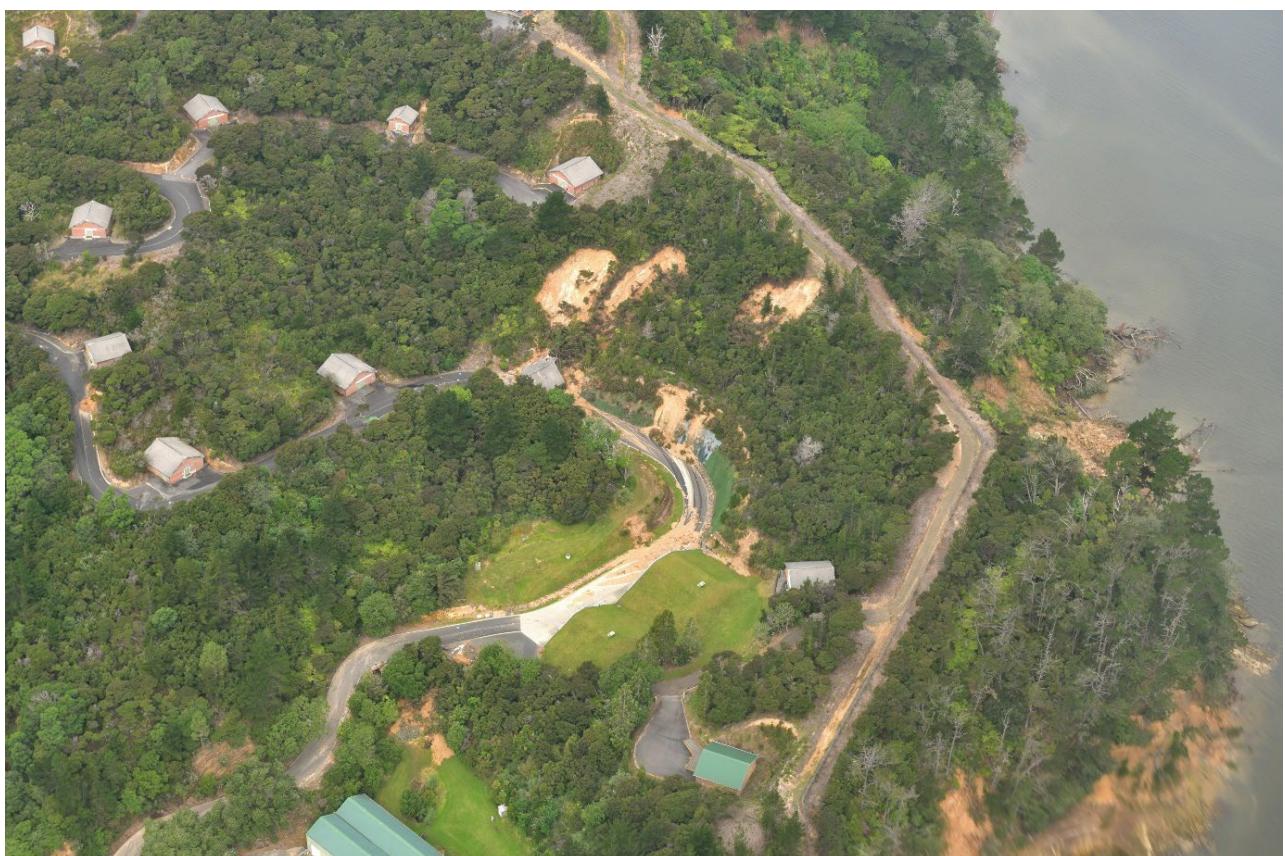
Photo 856\_4440: Multiple small failures at Onetaunga Bay, Chatswood. Note that one building has been pushed off its foundations and is now on the road.
